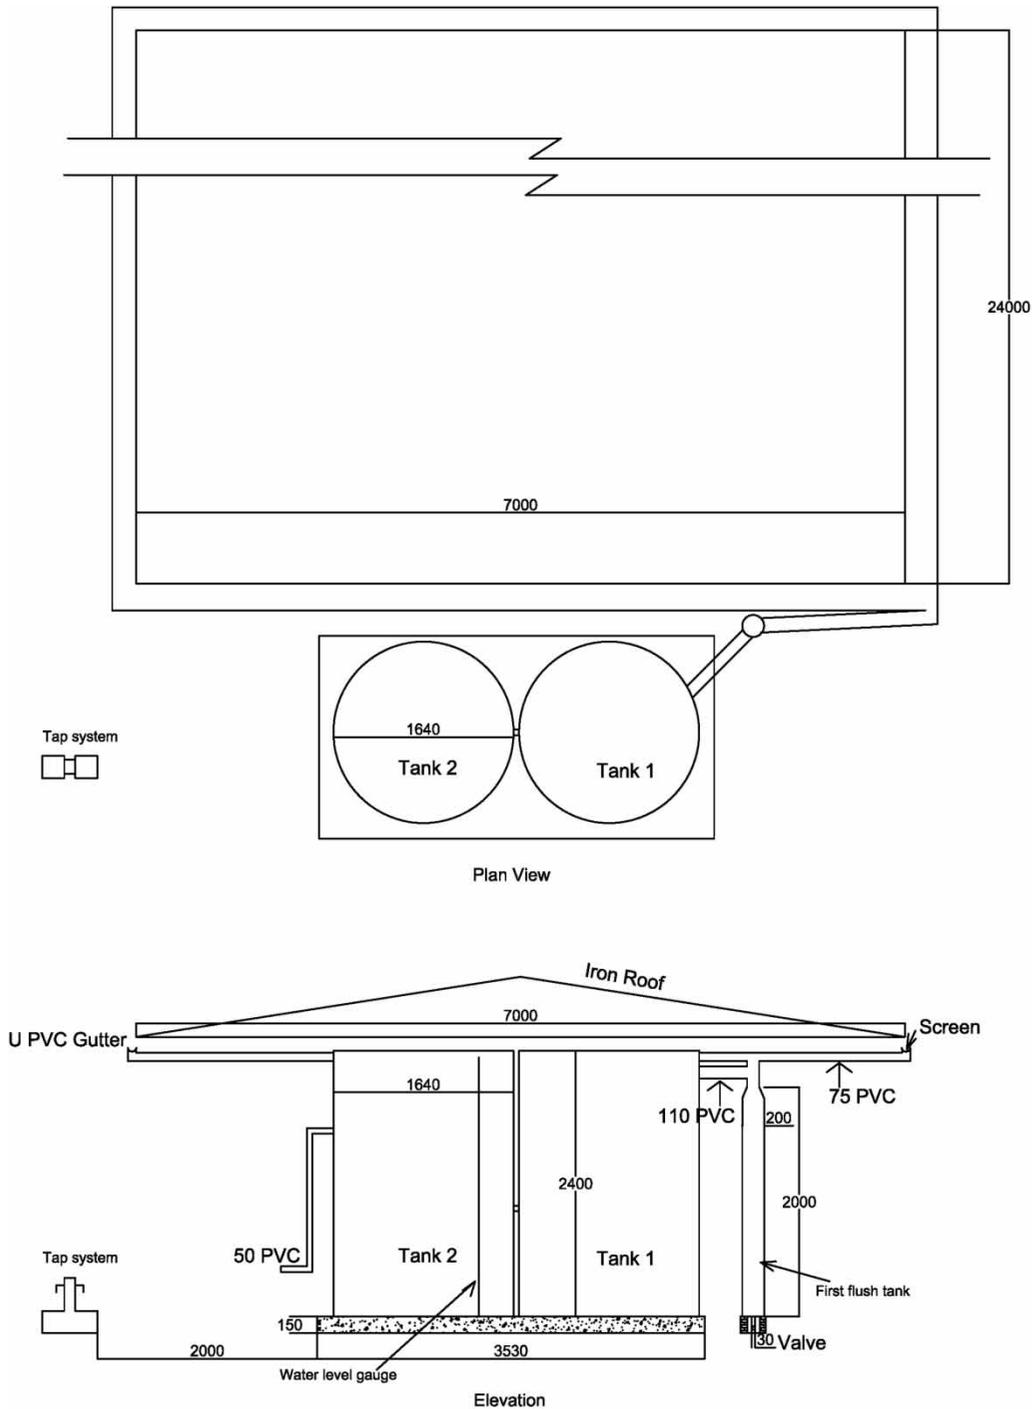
| Schematic of the RWH system at the Mnyundo Primary School, plan and elevation views, showing the treatment and monitoring components.
